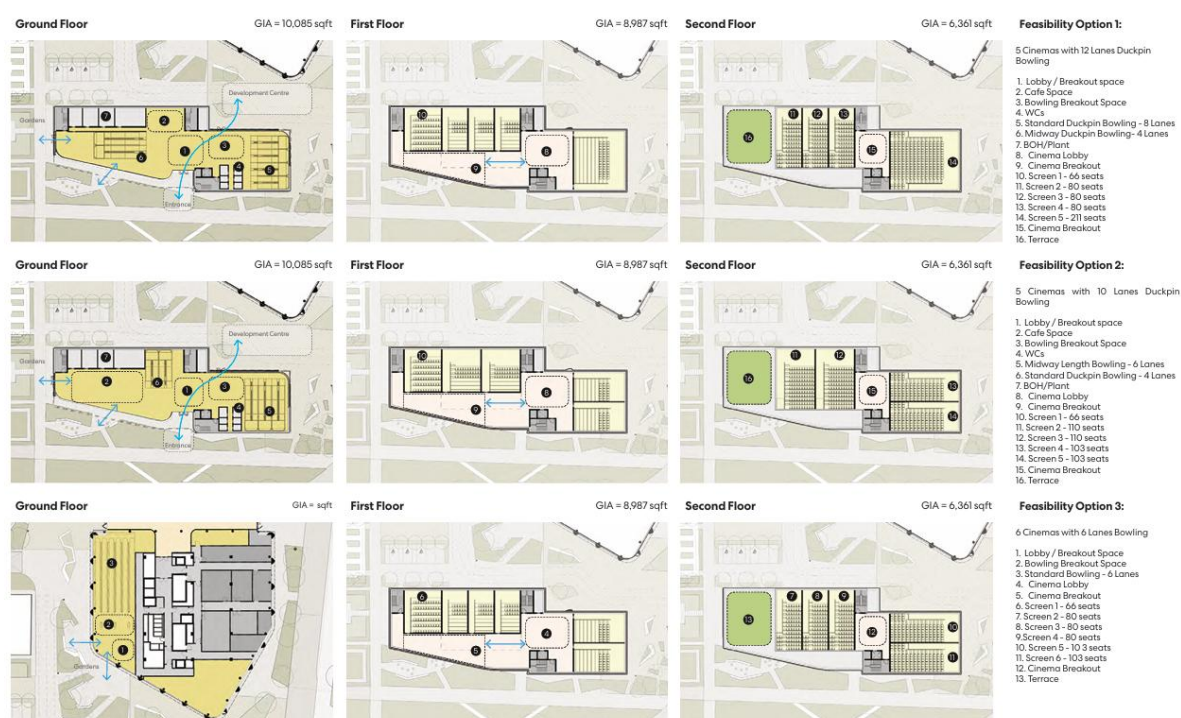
Extract from Design and Access Statement with possible floorplans for building E.
